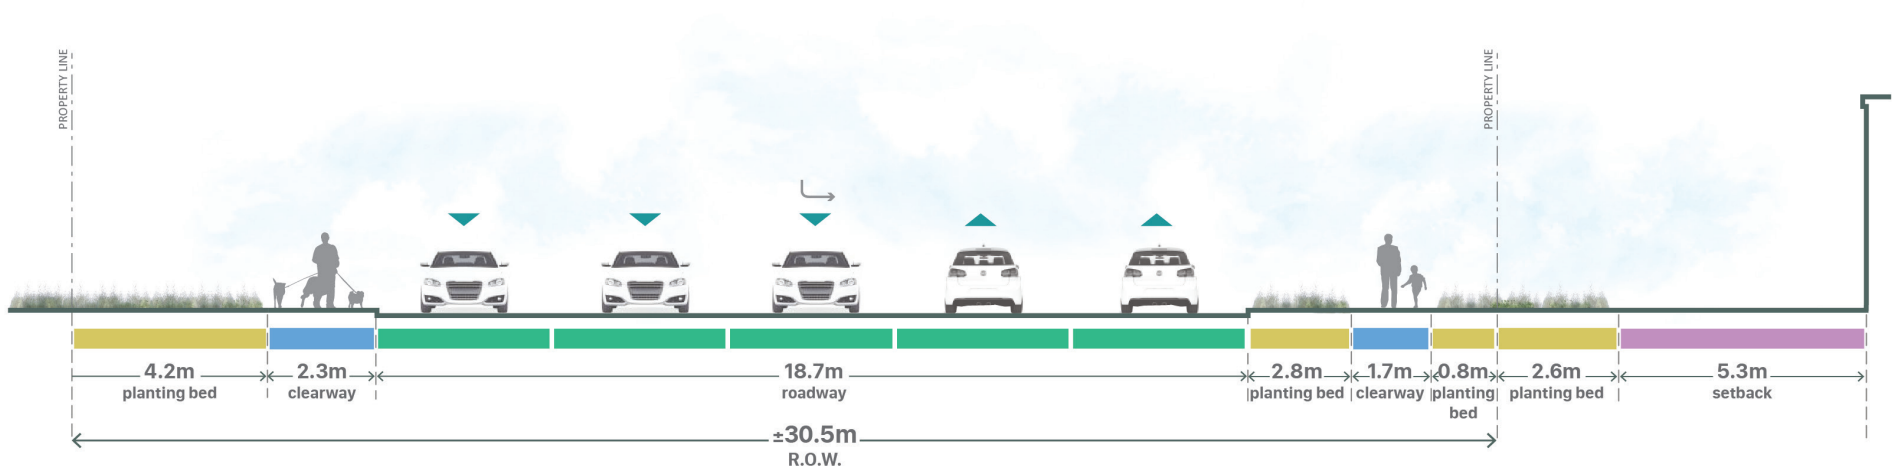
Section AA - Lawrence Avenue East - Existing Condition
